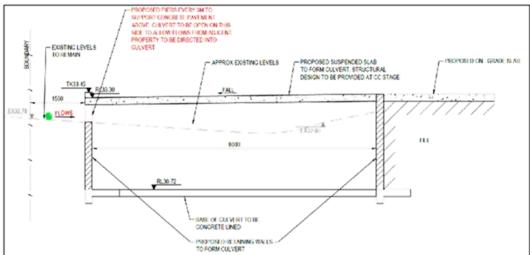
Typical Culvert Cross Section (along Western Boundary)
